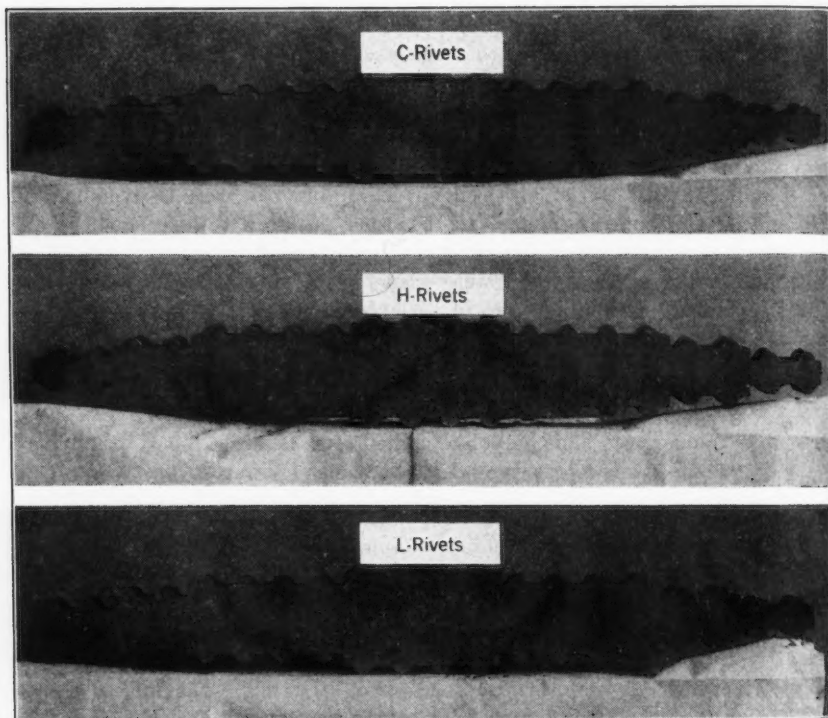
SECTIONS OF TESTED RIVET PACKS
